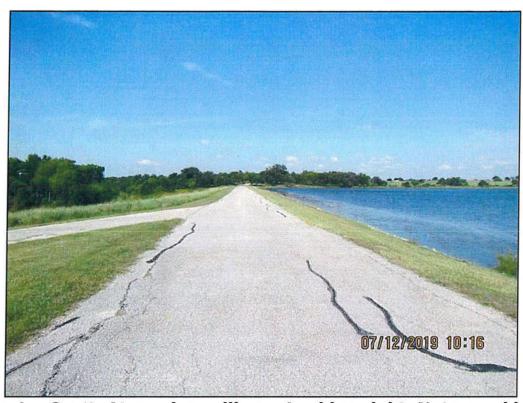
Crest. At service spillway. Looking right. Note cracking in asphalt concrete.
